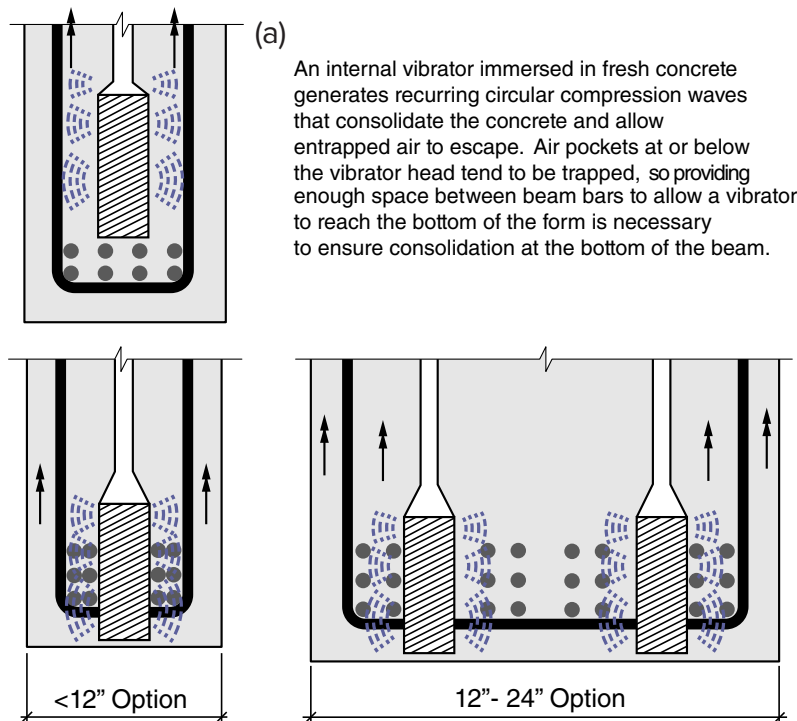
Potential options for lap splices of continuous bottom reinforcing bars in beams. (Image courtesy of Concrete International, December 2009, *Beam-Column Joints*, and *CRSI Reinforcing Bars: Anchorages and Splices*, 2022.)
